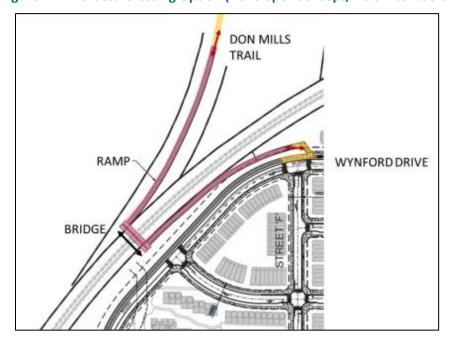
Elevated Crossing Option (Developer Concept, No Switchbacks)
